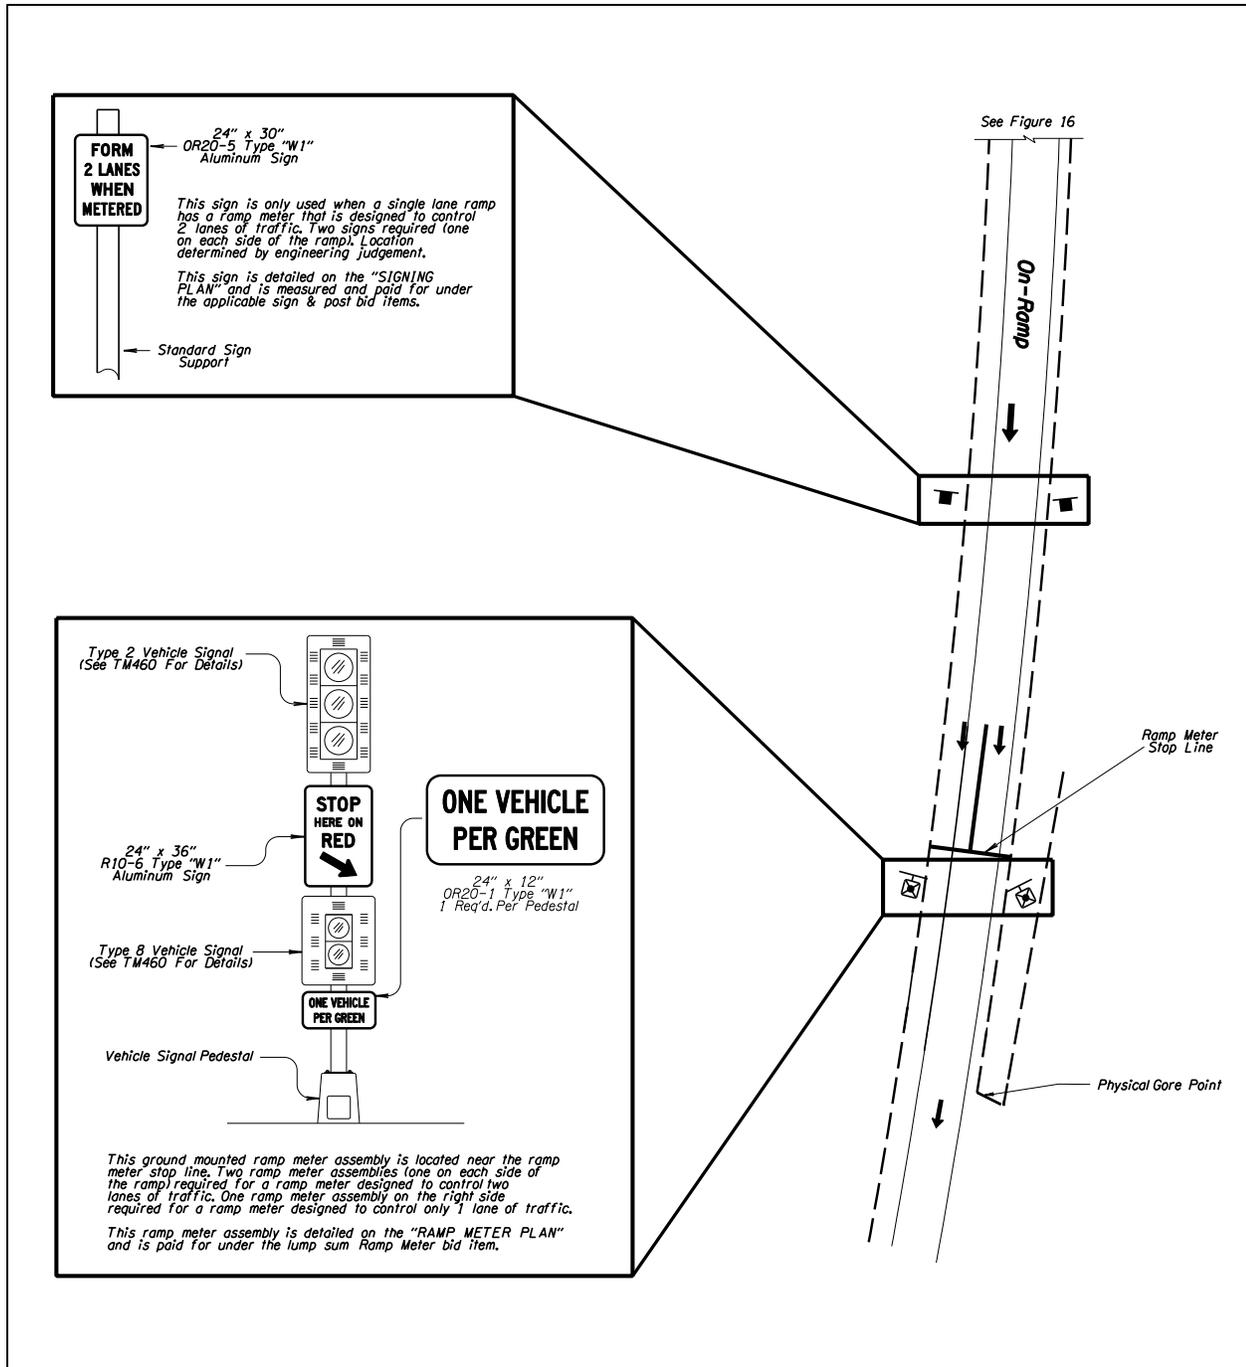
| Low Mount Sign Installations – Freeway Ramp Terminals
